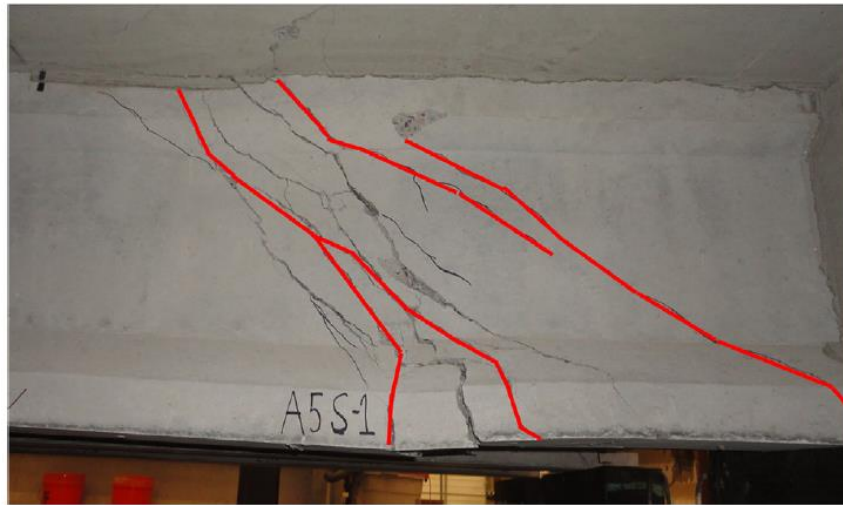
Girder B final cracking (cracking at 334 kN of load outlined in red) [30]
